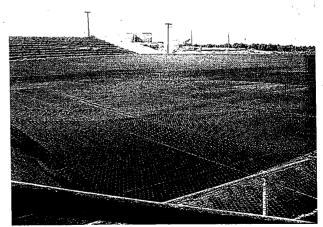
View of a separation sumps and wastewater sumps looking west.
